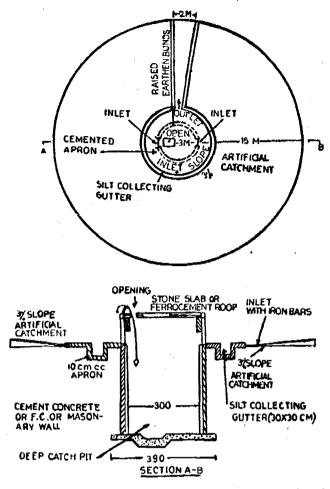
Construction of a family size water Tanka of 21 cm³.
